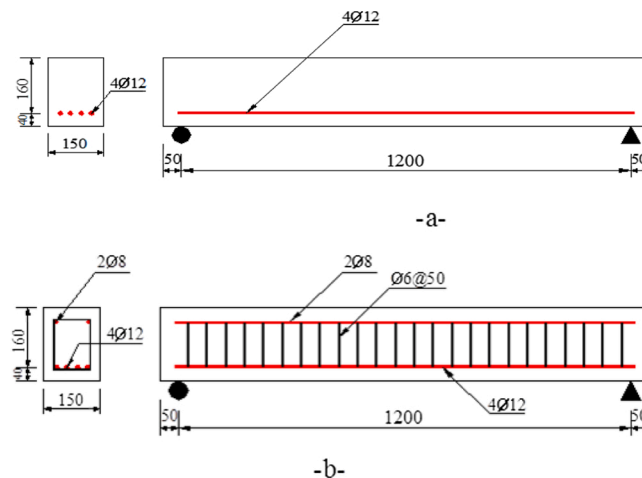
Reinforcement details (a) for beams without stirrups, (b) for beams with stirrups (all dimensions are in mm).
